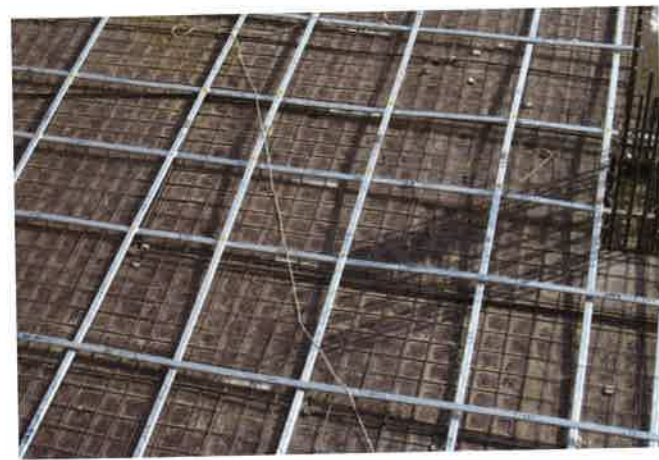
Slab Reinforced with Grouted Tendon Using Metal Ducts (P164)
